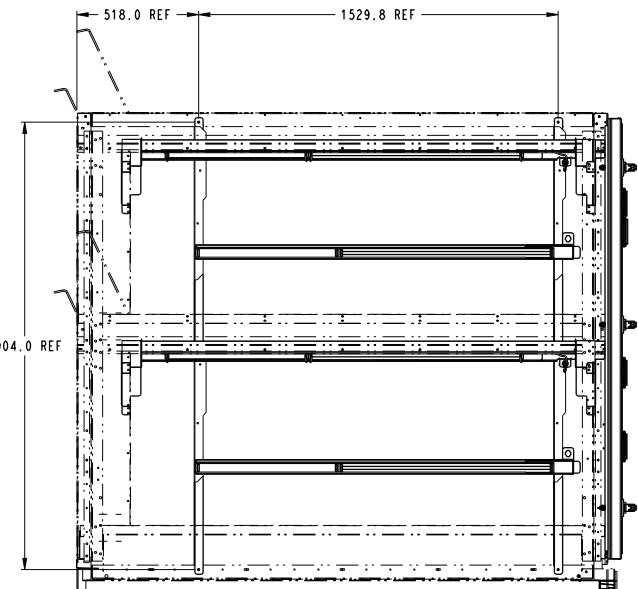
Typical UV-C Lamp and Fixture Kit Installation on 48/50V (55-100 Tons)
